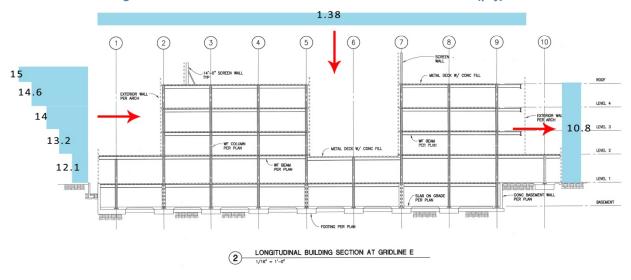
Longitudinal Section with the E-W Wind Load Pressures (psf)
